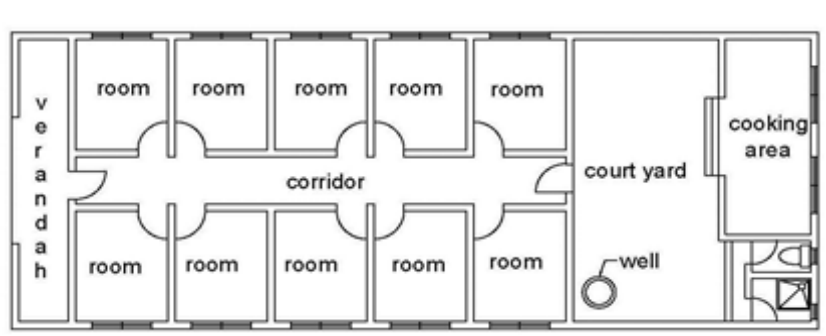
Typical Face-me-I-face-you multiple household dwelling in Ayobo, Nigeria
